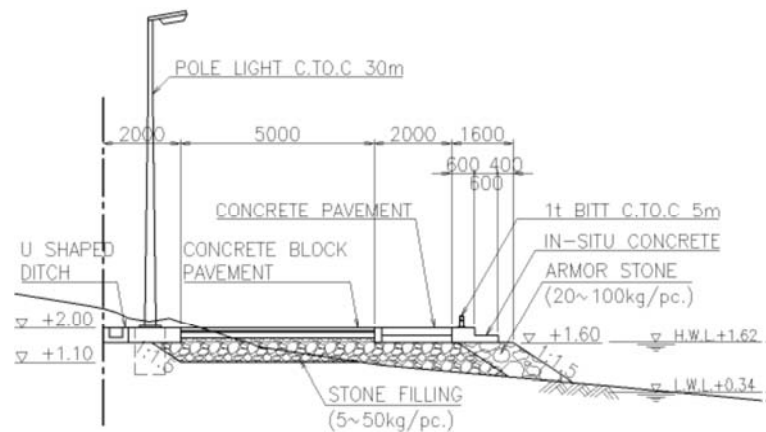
(11) Standard Cross-Section of Access Driveways
